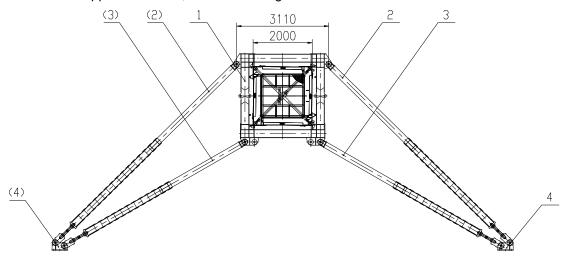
The retractable attachment frame YWB-FZJ2000
